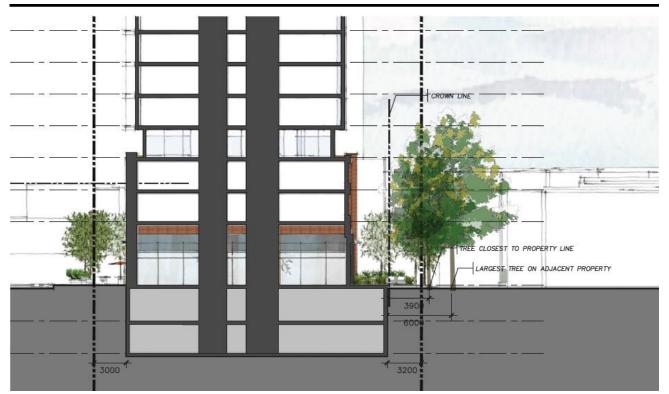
a cross-section of the proposed building illustrating property lines and setbacks from neighbouring properties. The underground parking is setback to avoid damaging the root system of existing mature trees. Hobin Architecture 2020.
